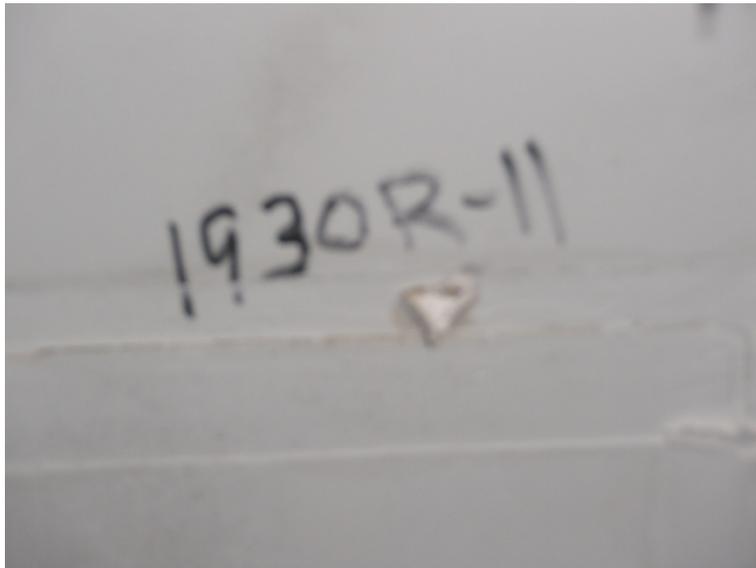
Drywall/JC (1930R-11) Kitchen Ceiling. No Asbestos Detected.
